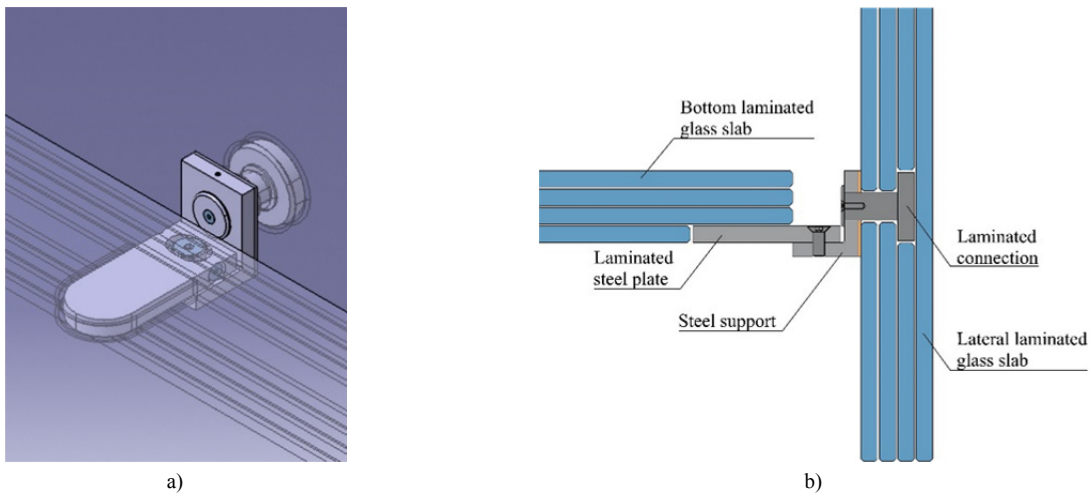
Isometric view of the floor connection, b) detail of the connection.
